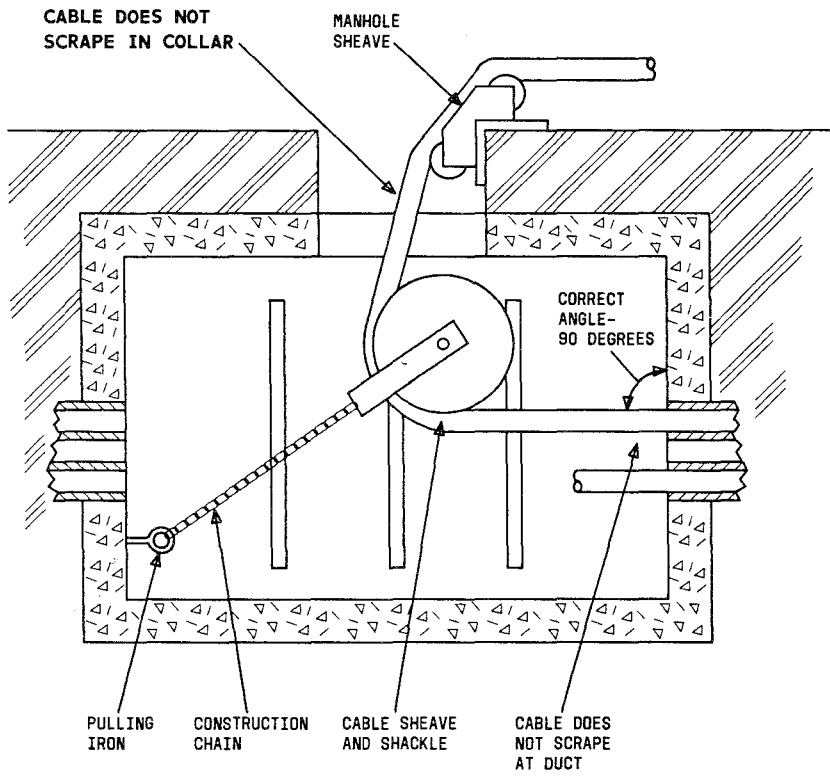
Proper Equipment Alignment Using Cable Sheave and Shackle
